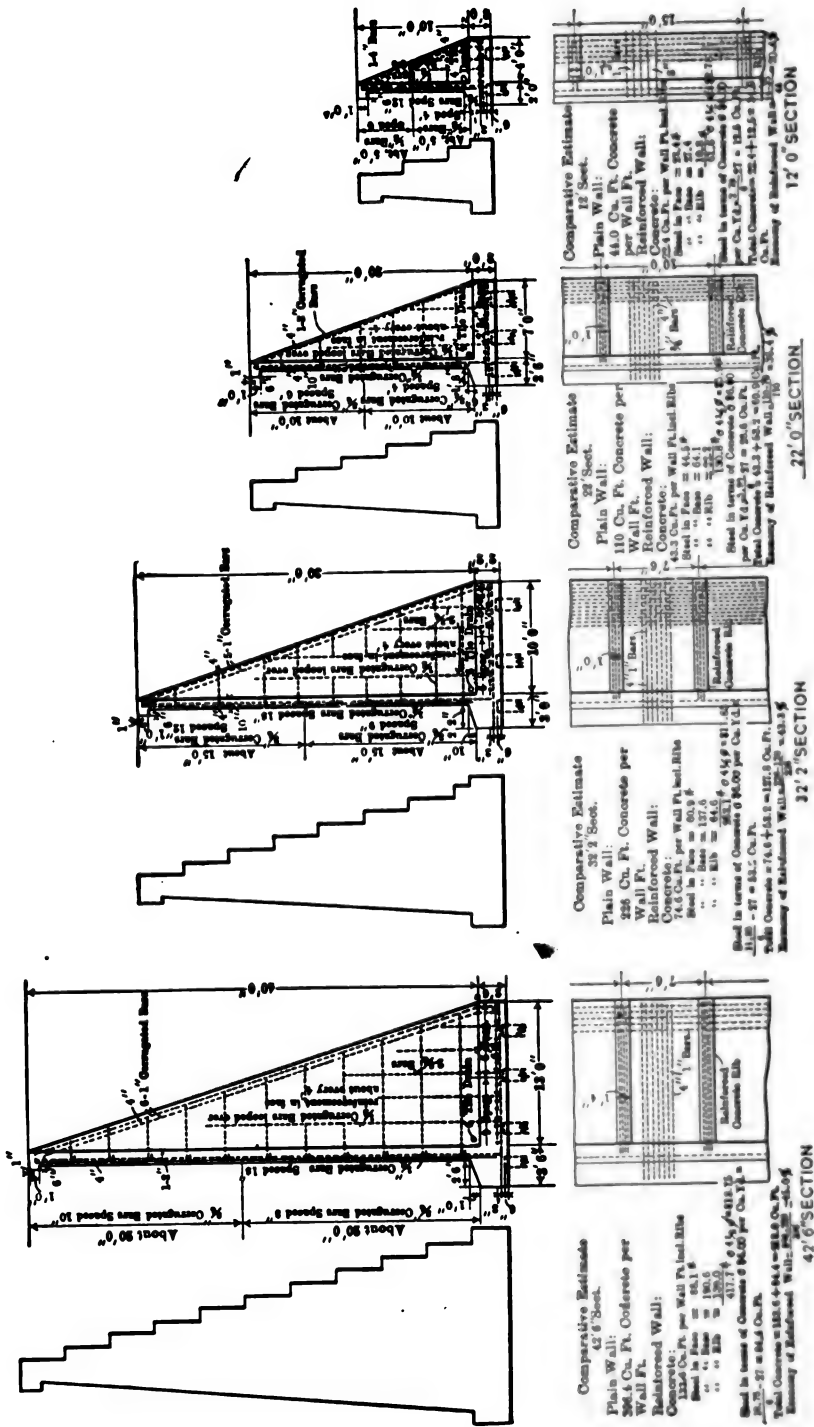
GREAT NORTHERN R.R. RETAINING WALLS.
